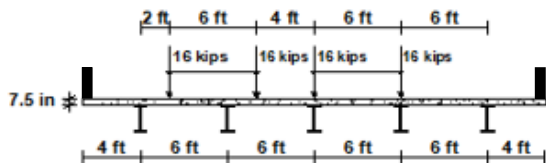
Typical two-lane bridge cross-section with standard railings on both edges (x1, 2R) and HS20 trucks loading.
